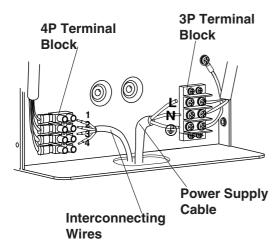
Power Supply Cable and Interconnecting Wires Connection
